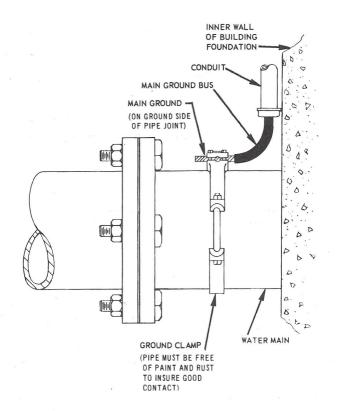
A water main at the point where it enters the building from underground makes a good main ground.
